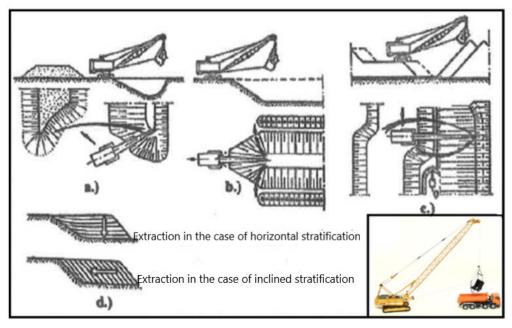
Work execution schemes with the dragline excavator a - digging trenches - side excavation, b - digging trenches - frontal excavation, c - discovery - frontal excavation, d - ways of excavation depending on rock stratification
